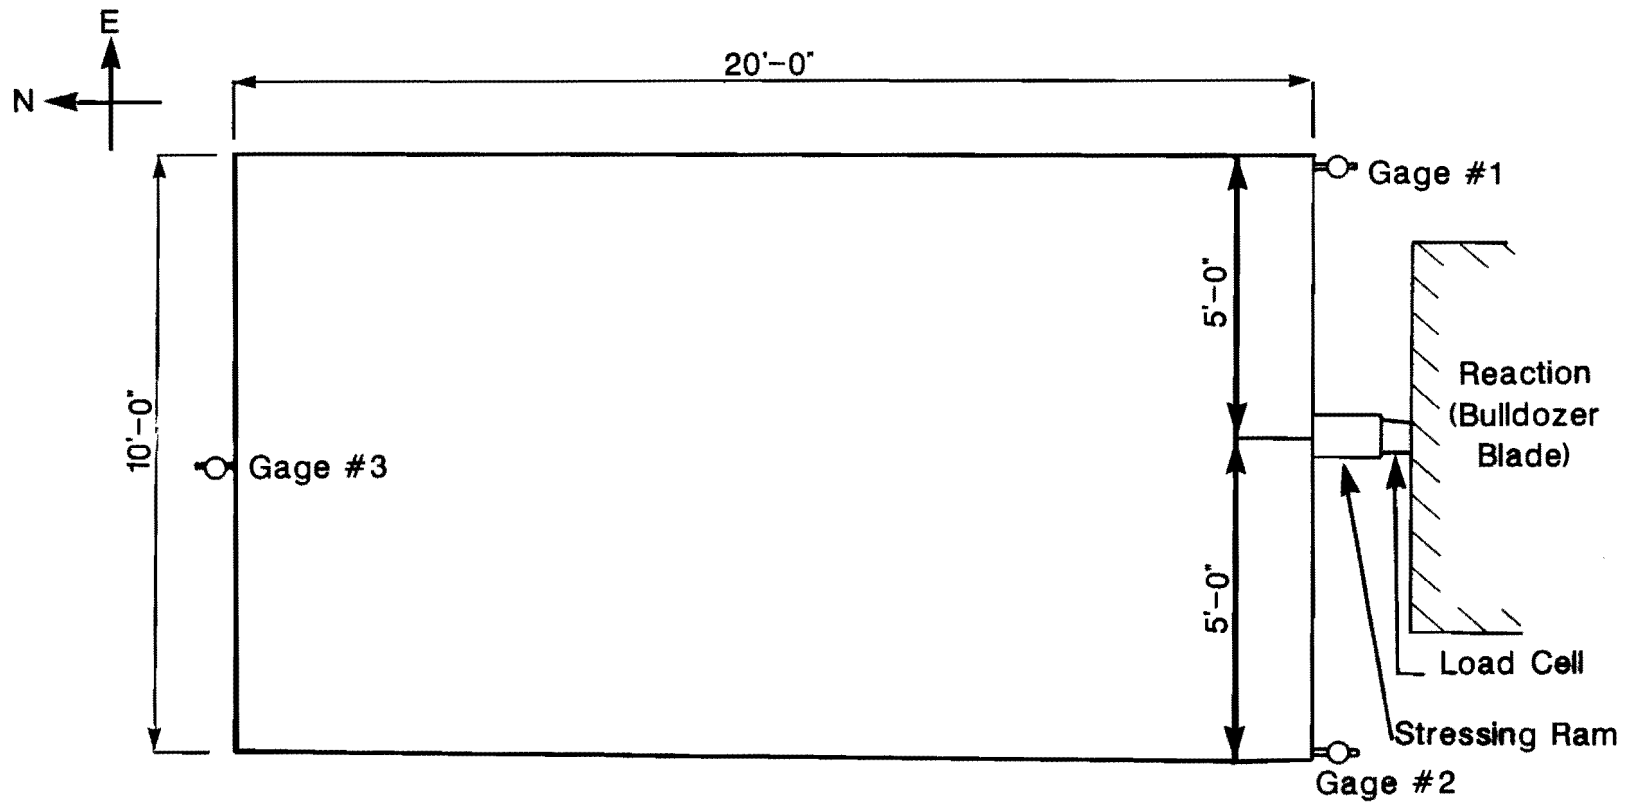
Layout of Test Slab No. 3 with single layer of polyethylene sheeting (small slab).
